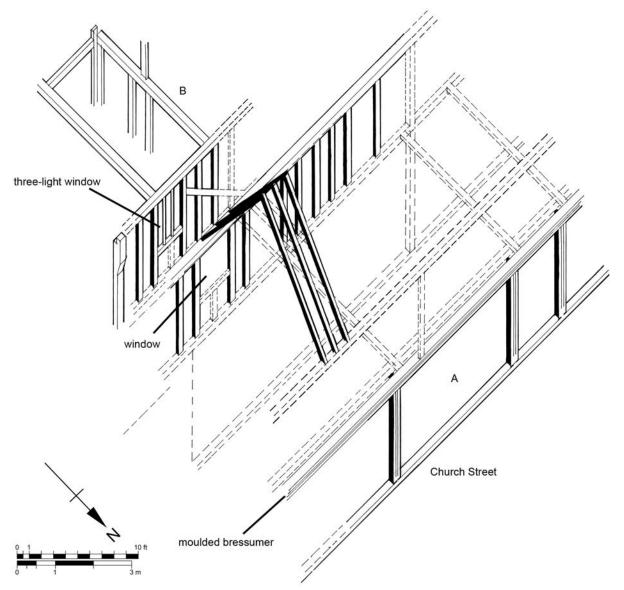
13 Church Street, looking east towards Head Street (corpus no. 3)
